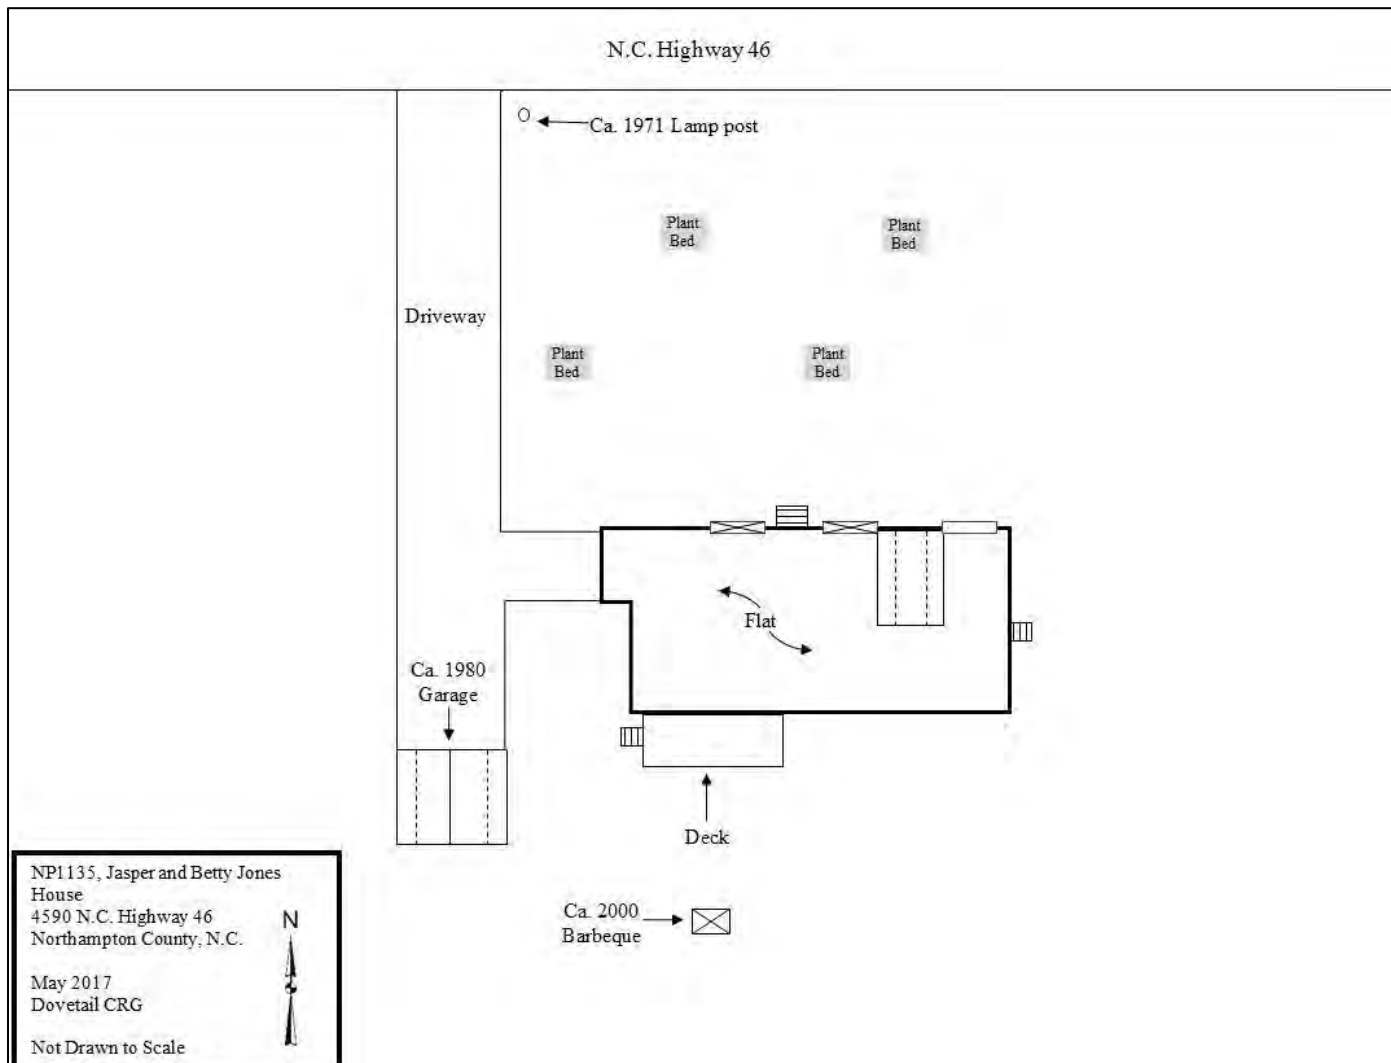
Jasper and Betty Jones House at 4590 Lawrenceville Road (NP1135) Site Plan.
